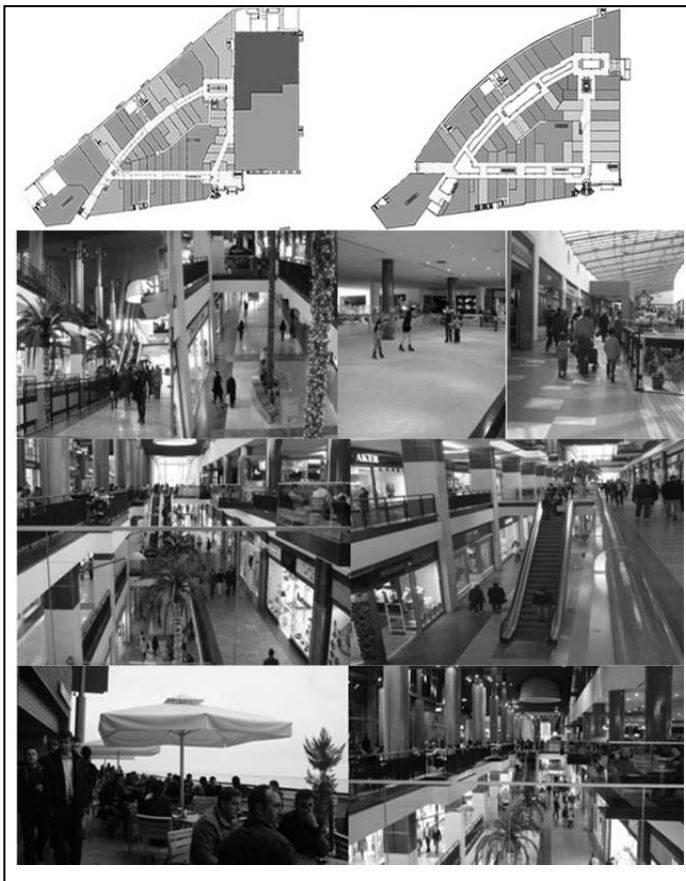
First- and second-floor plans of Forum Shopping Centre and interior views.
